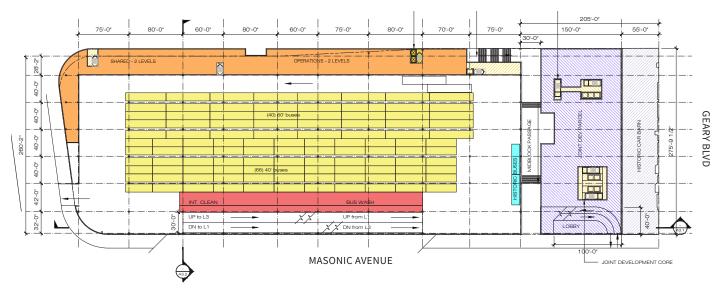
BUS FACILITY CONCEPT DESIGN - SECOND LEVEL PLAN
